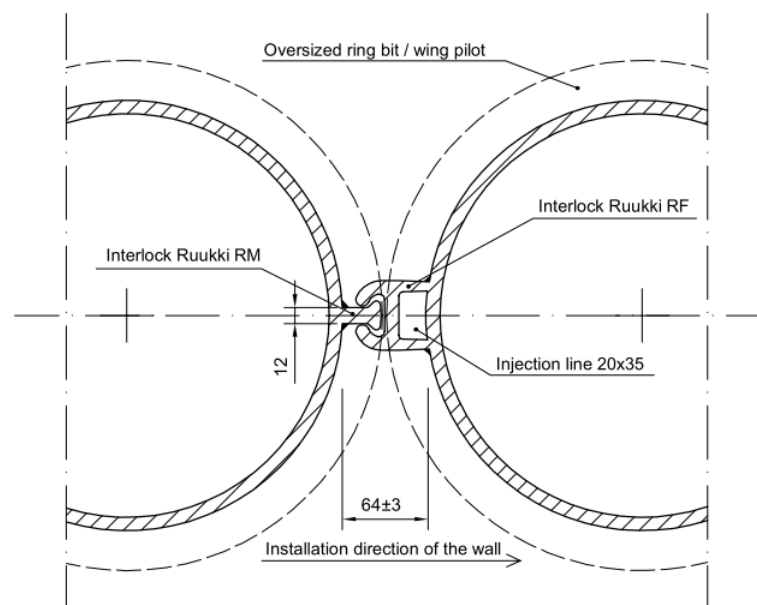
Cross-section of an RD pile wall with RM/RF interlocks [Ruukki 2013]
